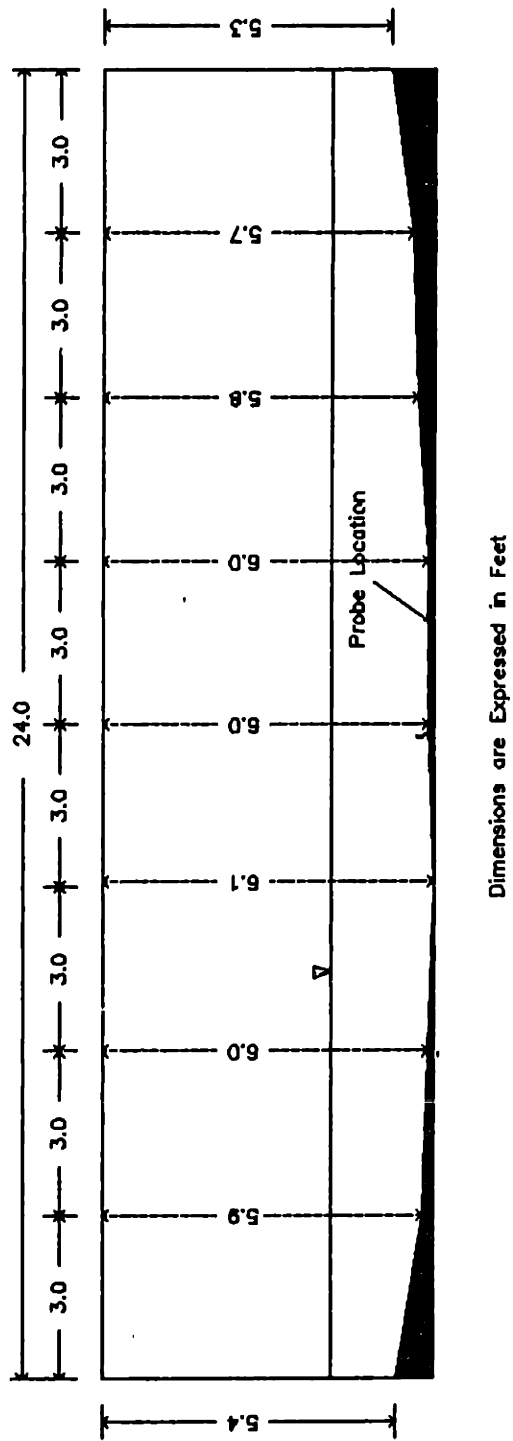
Cross-Section of Fowle Brook at the Upstream Face of the Wooden Footbridge at Streamgauge Site 4.
